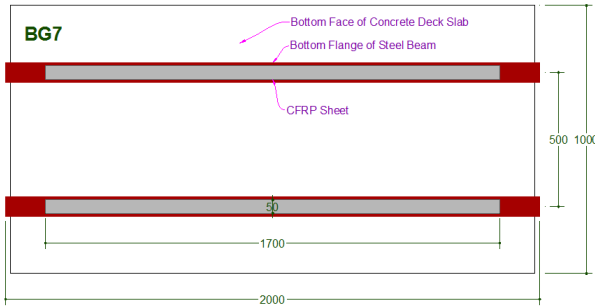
Cross Section of a Typical Sample (Dimensions in millimeter)
